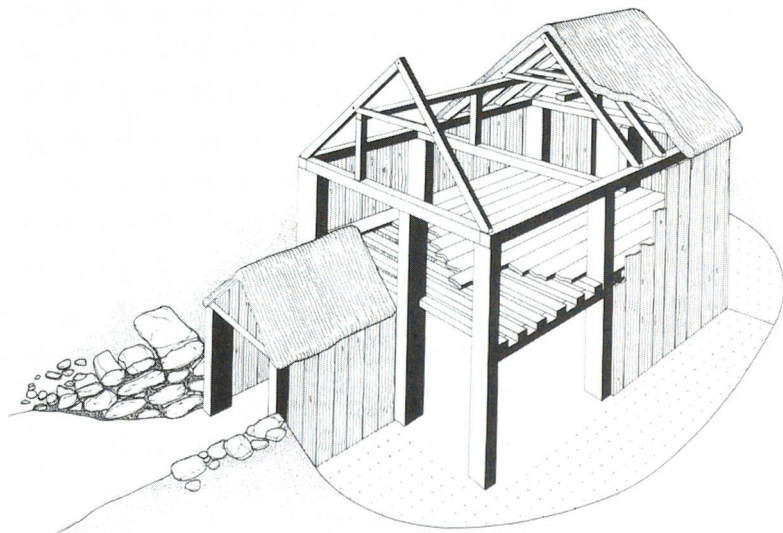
Reconstruction of sunken-featured house, Peter Street, Waterford, built c. AD 1080.
